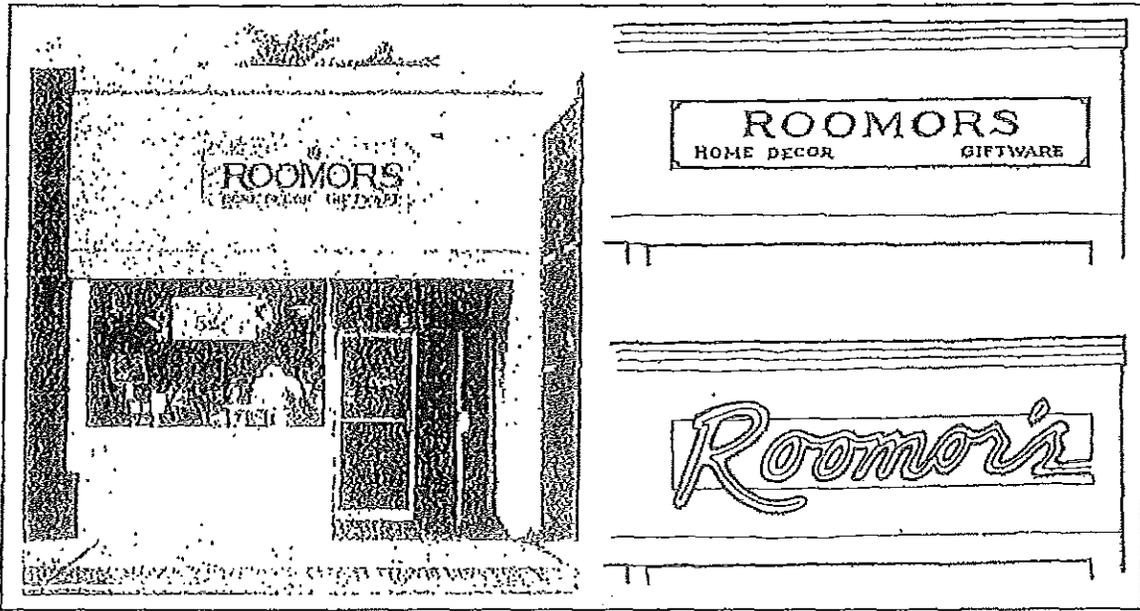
Proper proportioning of a sign and its lettering can add distinction to a building of modest design. This brick facade has a recessed panel above the storefront that creates a natural area for sign placement. The same type of sign shown in the photograph becomes more impressive and relates better to the building when the sign board fills this area and the spacing and proportioning of its letters are corrected to project a different image of the business, neon or channel letters could be used in the same area.
